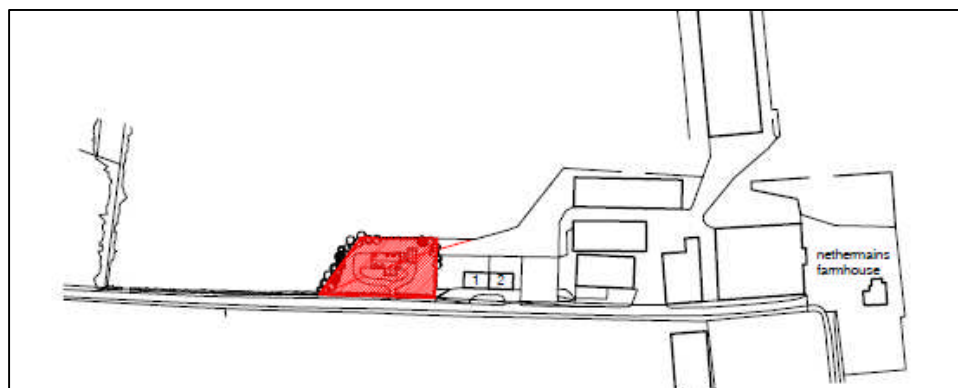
Site plan illustrating the relationship of the proposed dwellinghouse with the existing farm buildings and residential properties
